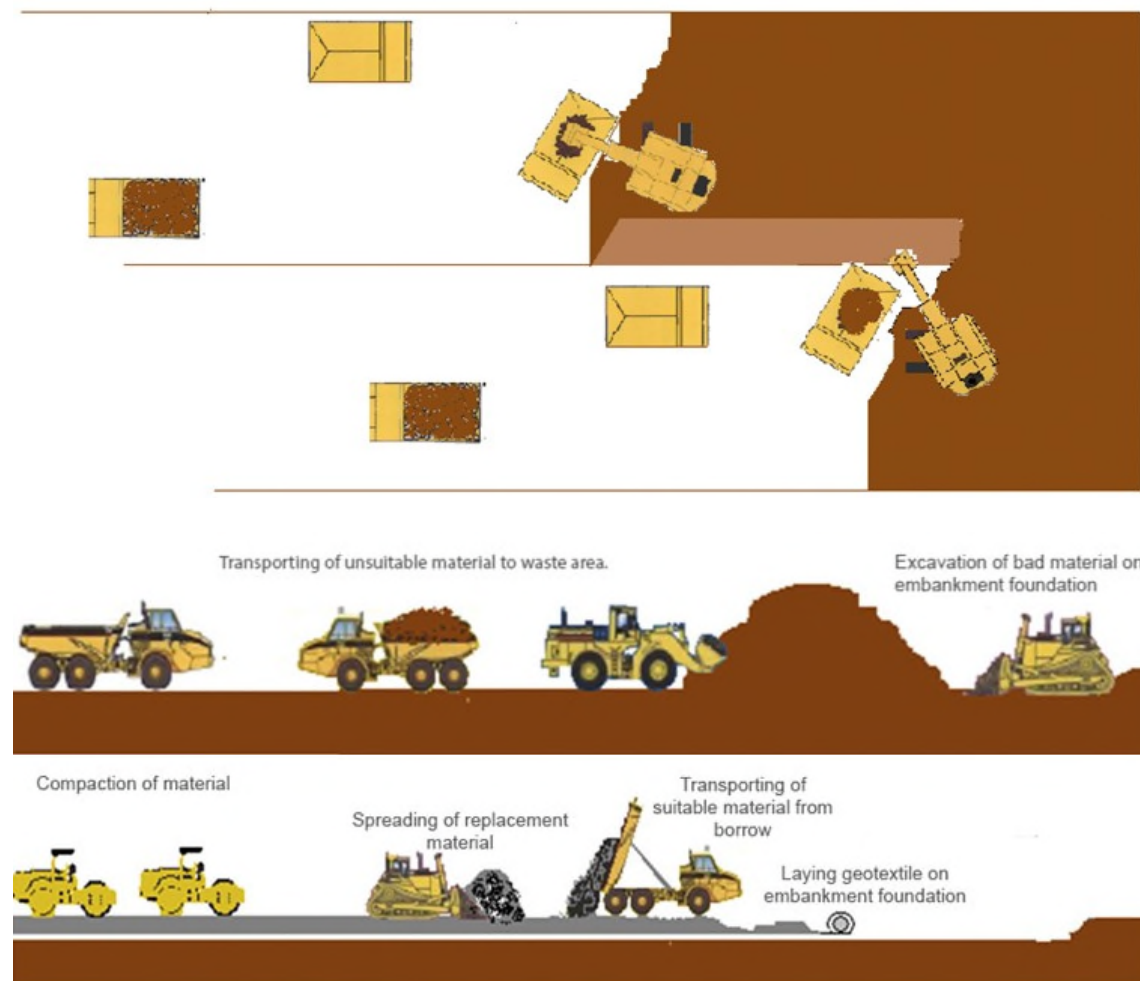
Example of Excavation and Hauling as well as Compaction Works along the Alignment
